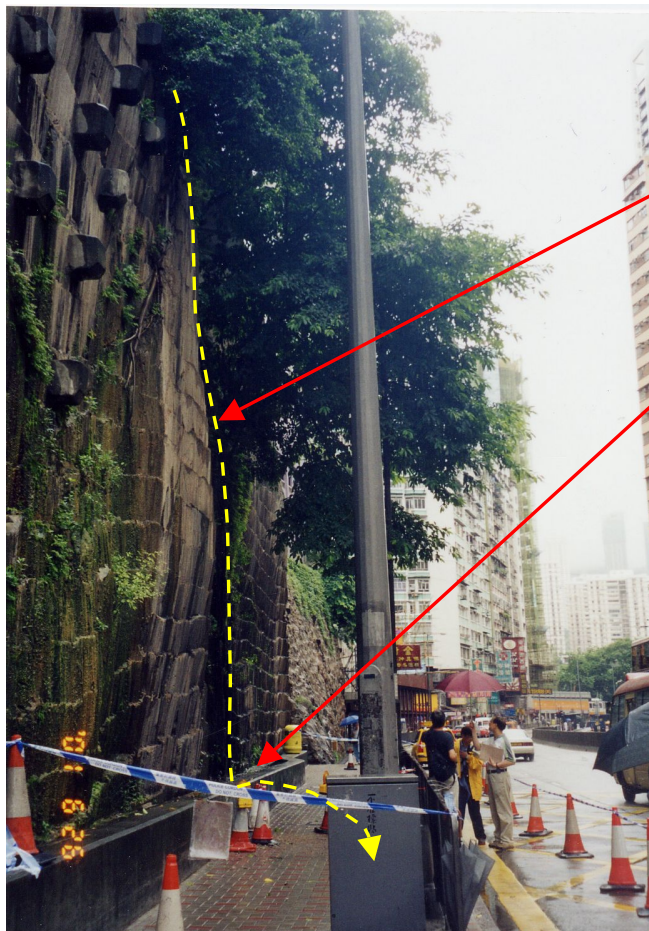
View East across King's Road towards Slope No. 11SE-A/C561
